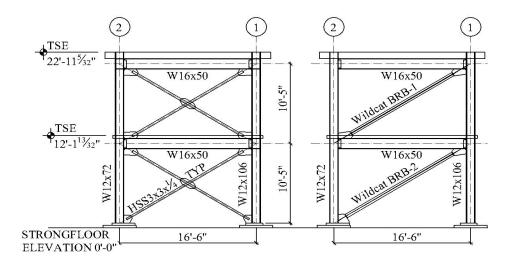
Specimen Elevations: (a) CBF with HSS braces; and (b) BRBF.
